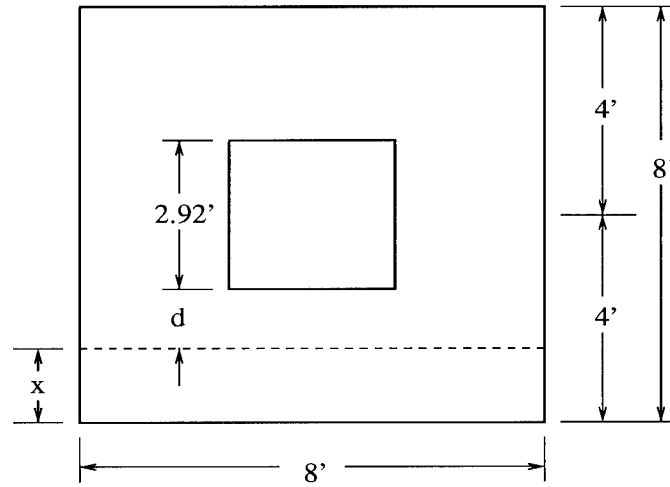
One-Way Shear on Column Footing: Beam Action
